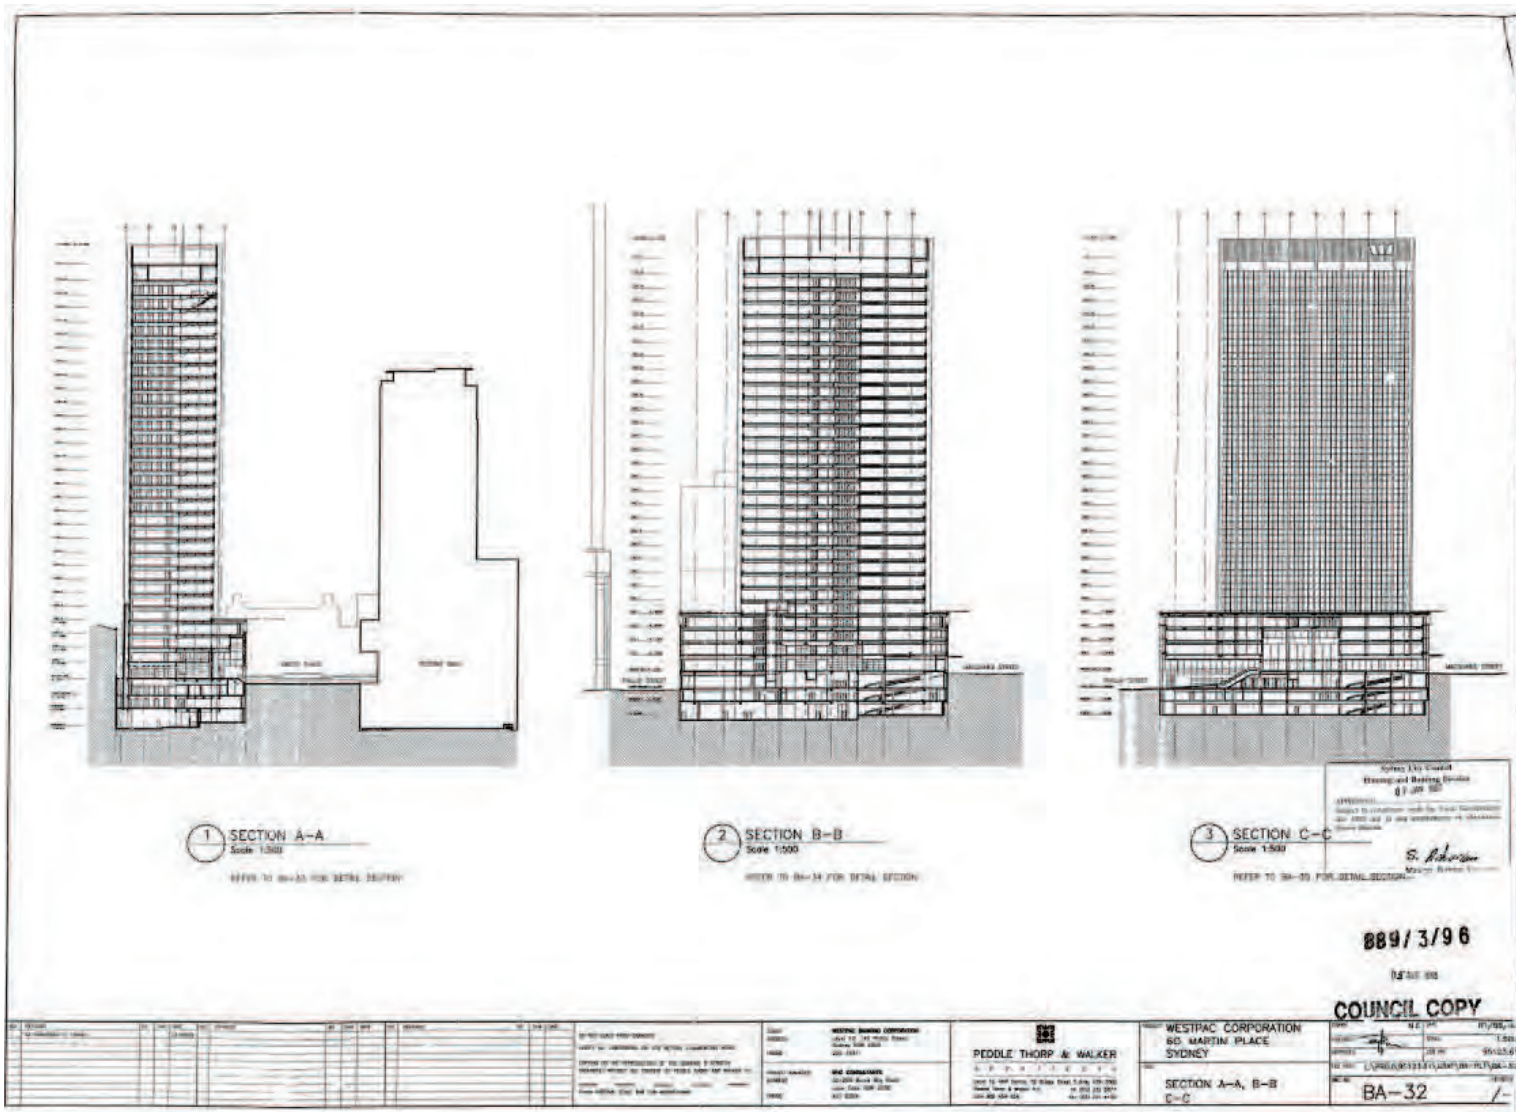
Section drawings of the podium additions at 60 Martin Place, Sydney. Section A-A illustrates the podium's relationship with the Sydney Hospital and the RBA building podium.
